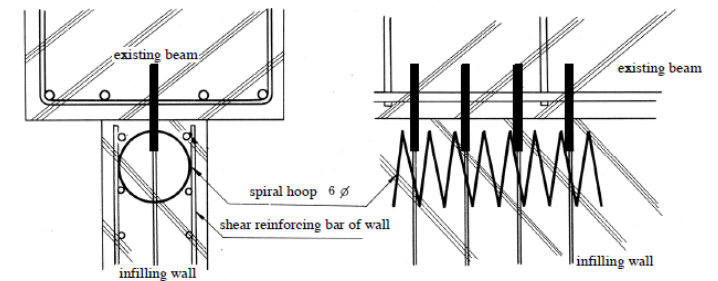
Strengthening against splitting with spiral reinforcing bars
